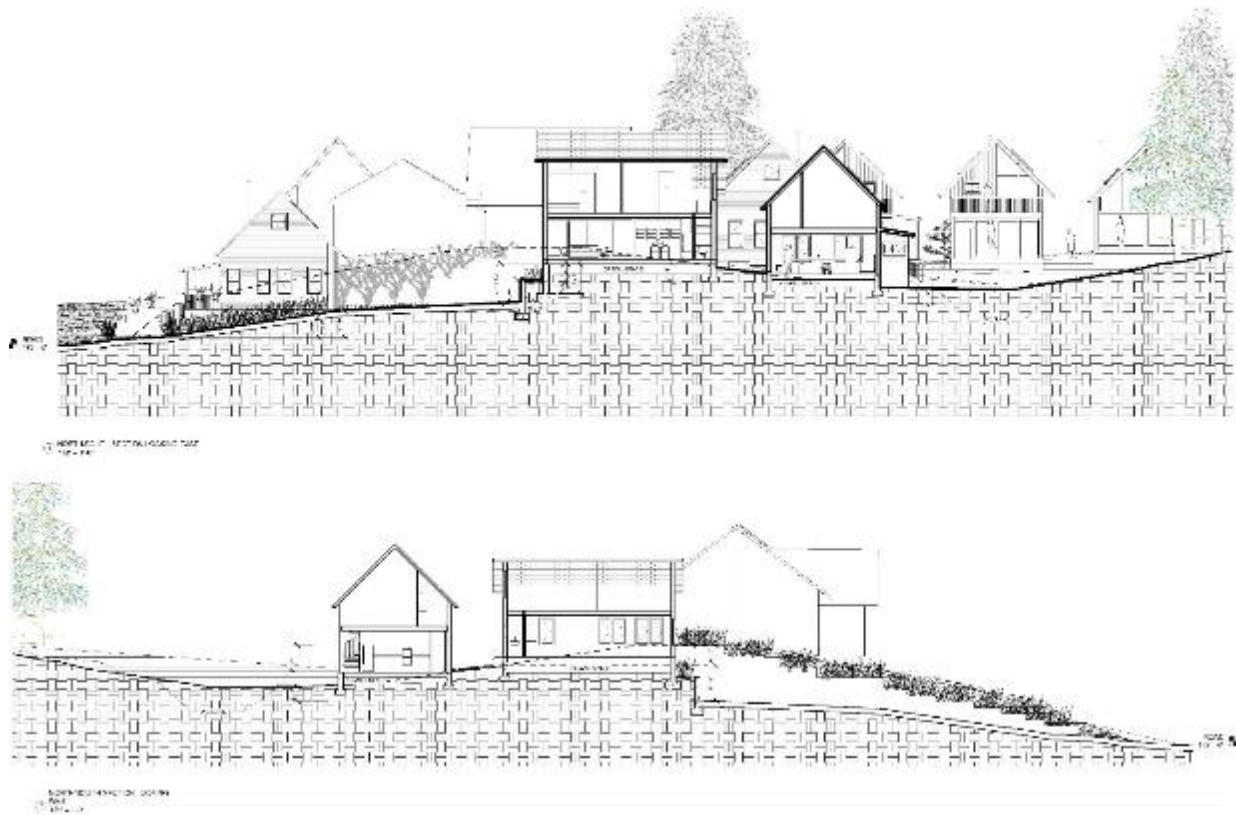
North/South Section Looking East Above / North/South Section Looking West Below
